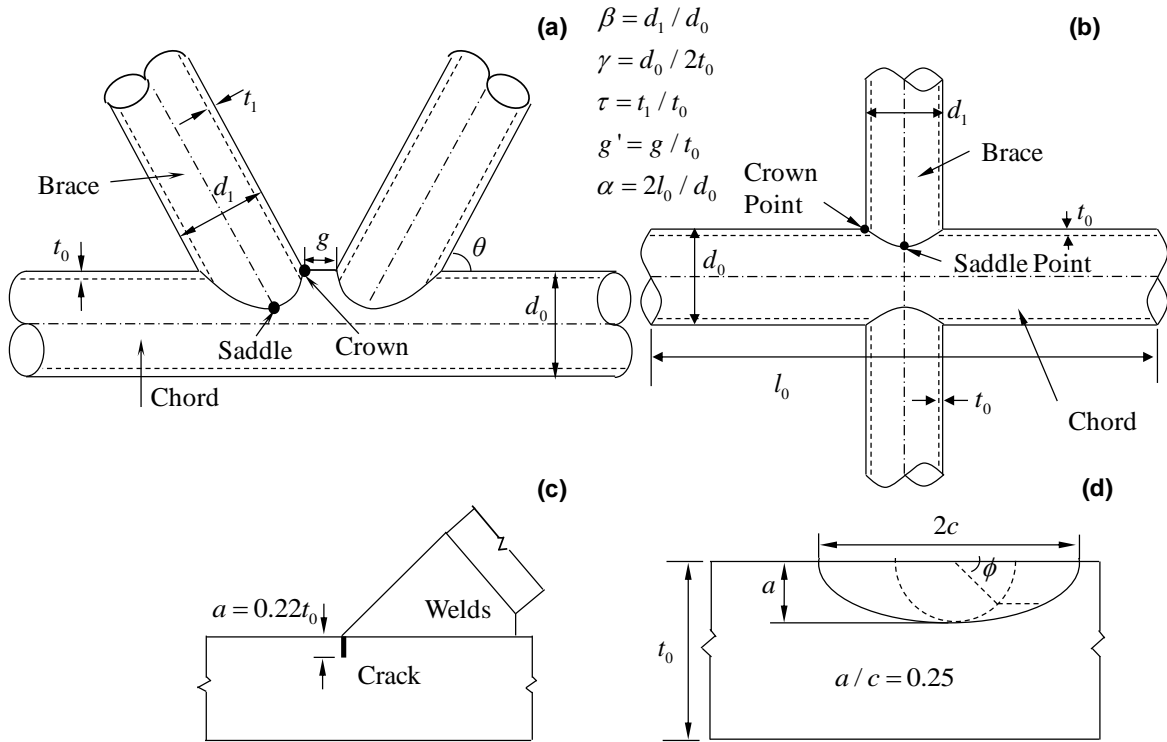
Geometric configuration of a typical CHS joint: (a) front view of a K-joint; (b) front view of an X-joint; (c) a surface crack at the weld toe; and (d) planar view of the surface crack.
